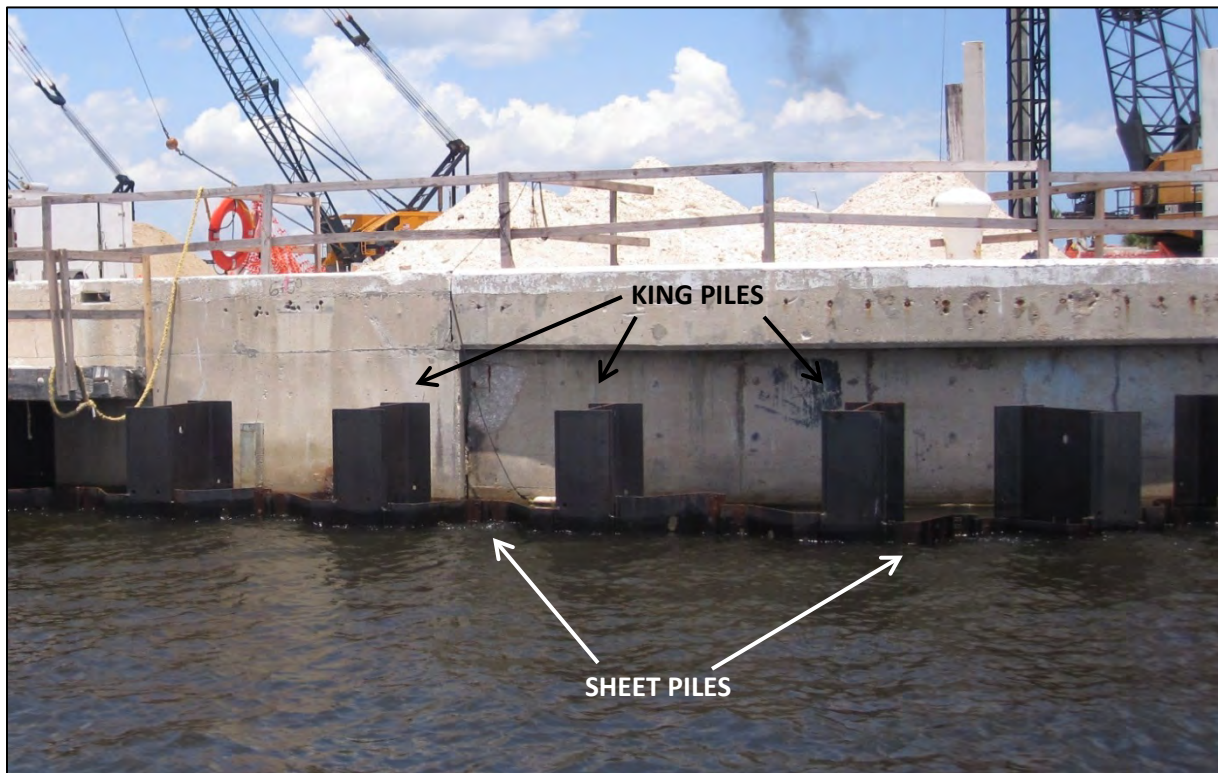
VIBRATORY INSTALLATION OF SHEET PILES AT NAVSTA MAYPORT
